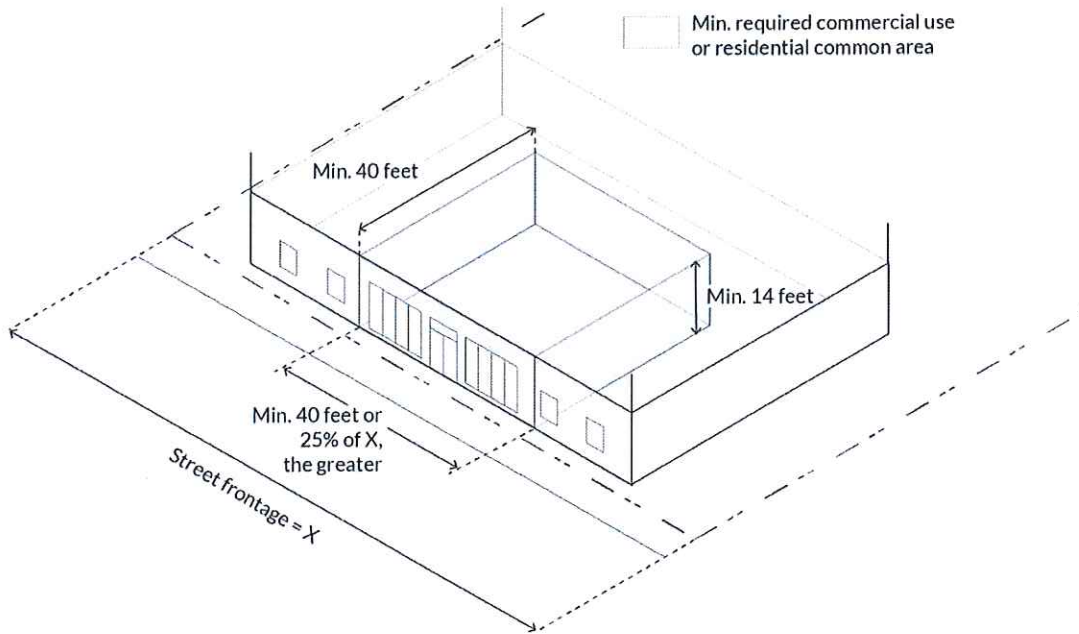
A: REQUIRED ACTIVE FRONTAGE, SITES LESS THAN 2.5 ACRES
